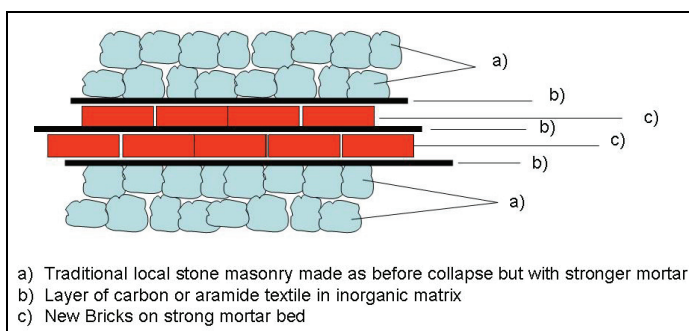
Proposed integrated texture for RECONSTRUCTION: FRCM reinforcing brick band at different level of new masonry
